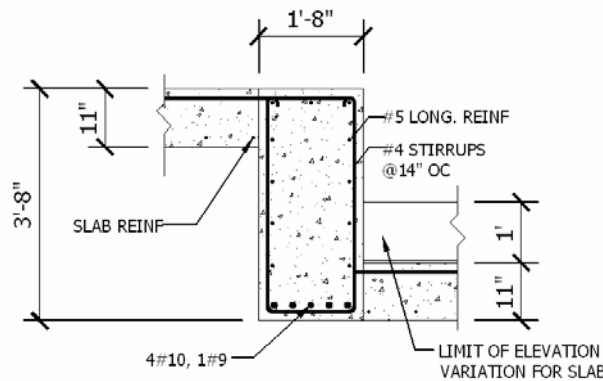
Sample Slab and Reinforcement Layout for Beam Spanning Column A4 to B4
